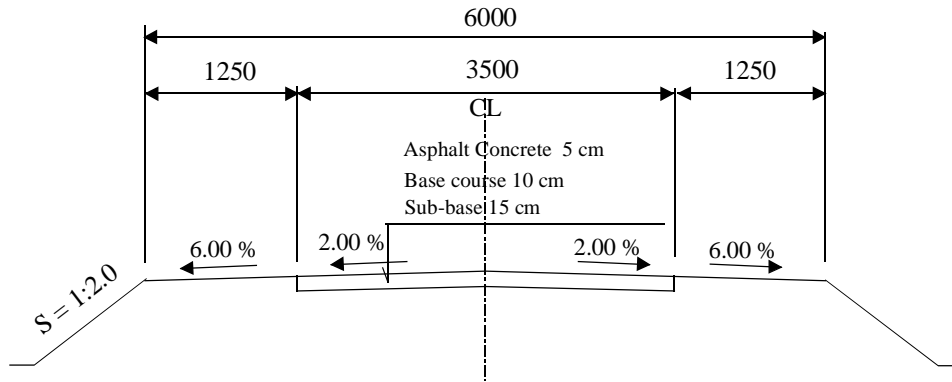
Asphalt Concrete Pavement Structure of KPC Road (Un-inundated Section)
